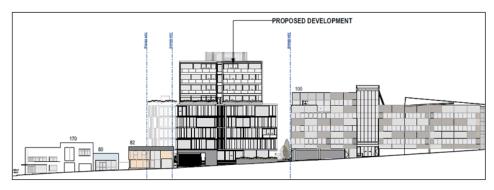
Melville Street elevation (source: JAWS ARCHITECTS, Street Elevation, Dwg 22013\_DA21 Rev 01, 9 May 2022)
